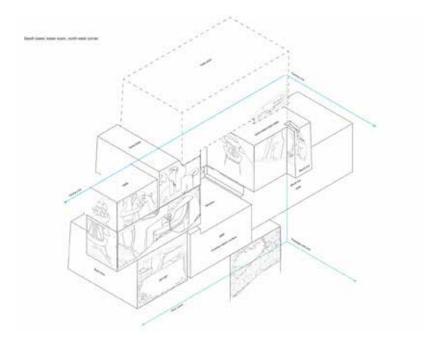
Preliminary study of the southern tower's upper room, western wall.
